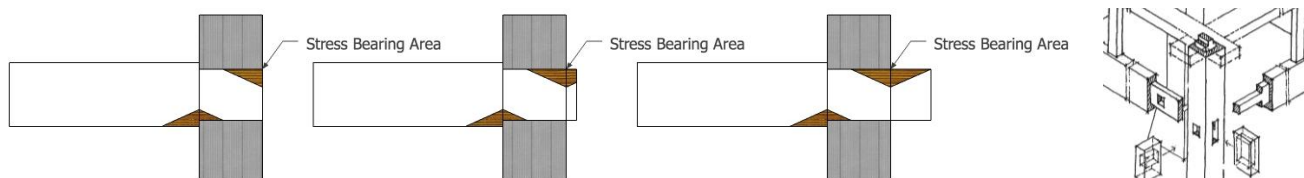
Basic type of joint construction and stress distribution against rotation (left) and detail of joint construction in Javanese wooden house (right) (Leerdam 1995)
